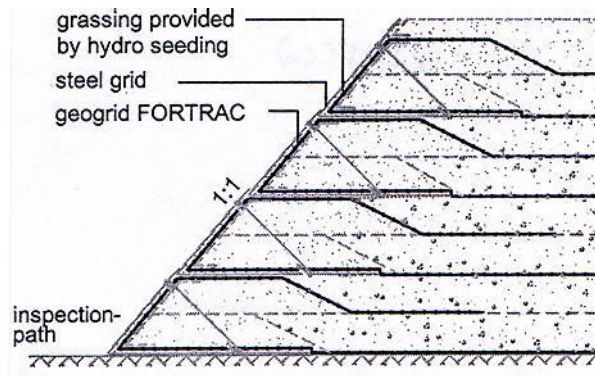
Detail of the geogrid-reinforced over-steep slope with „green“ grassed facing
